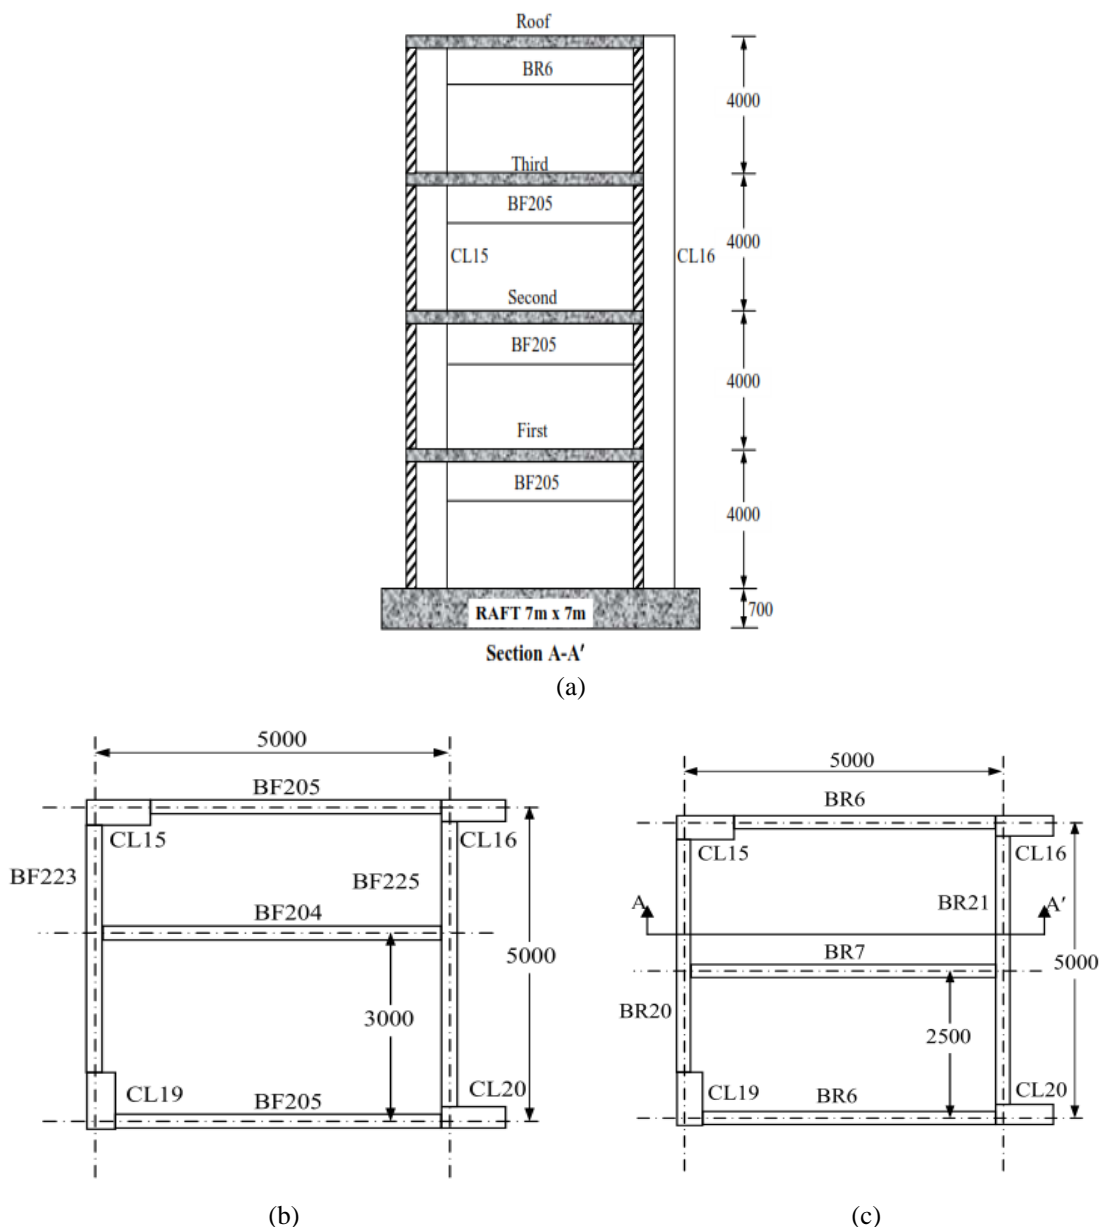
Overall geometry of structure (a) Elevation of the structure (b) Floor plan (c) Roof plan (Robin exercise BARC and CPRI and Ravi *et al.* 2014)
